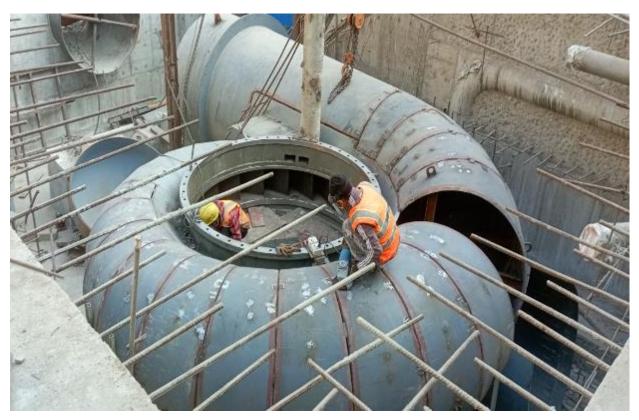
Unit 1 Spiral case segment being assembled and Tack Welding being done
